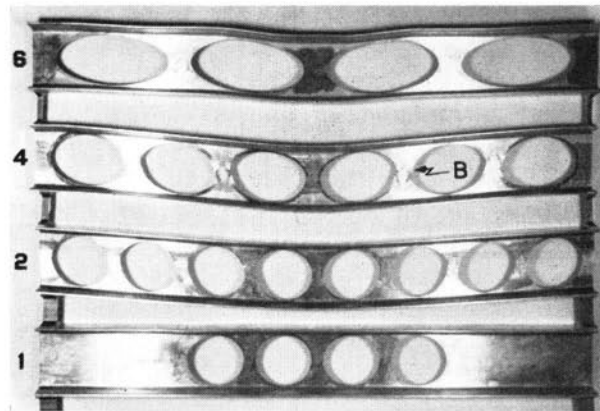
6-in. I-Beam Failures: No. 1 in Pure Bending, Others with Center Loading
